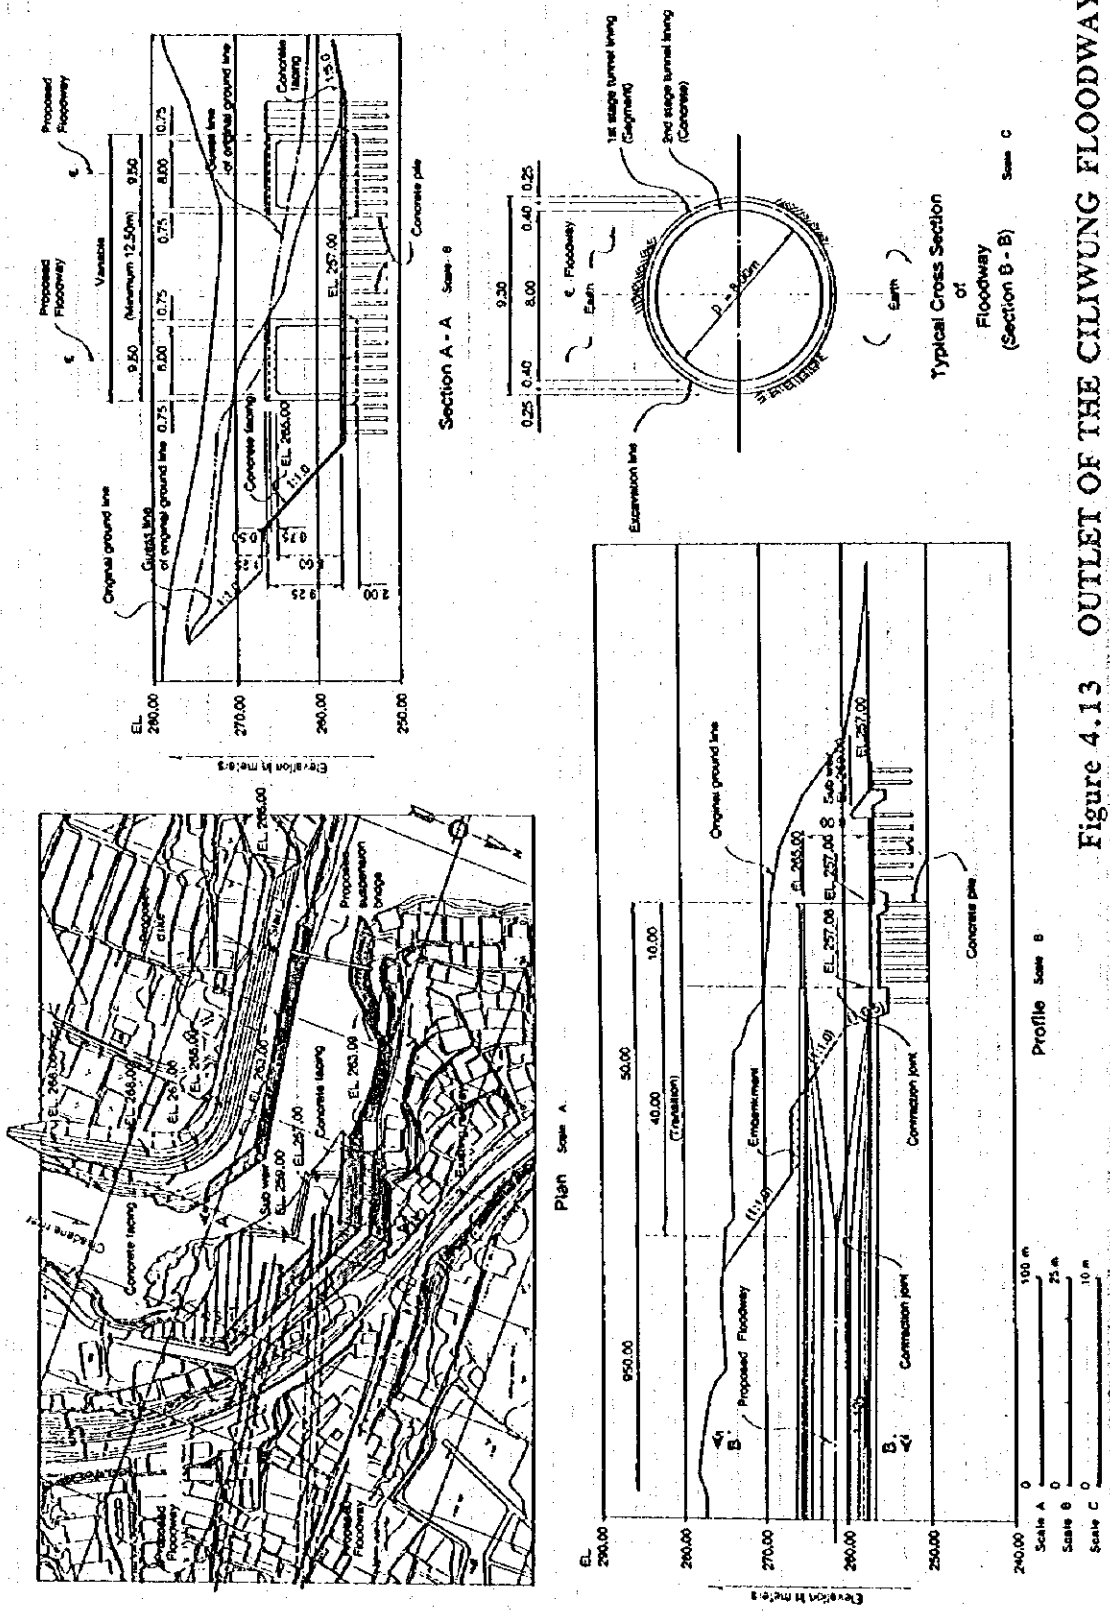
OUTLET OF THE CILIWUNG FLOODWAY
